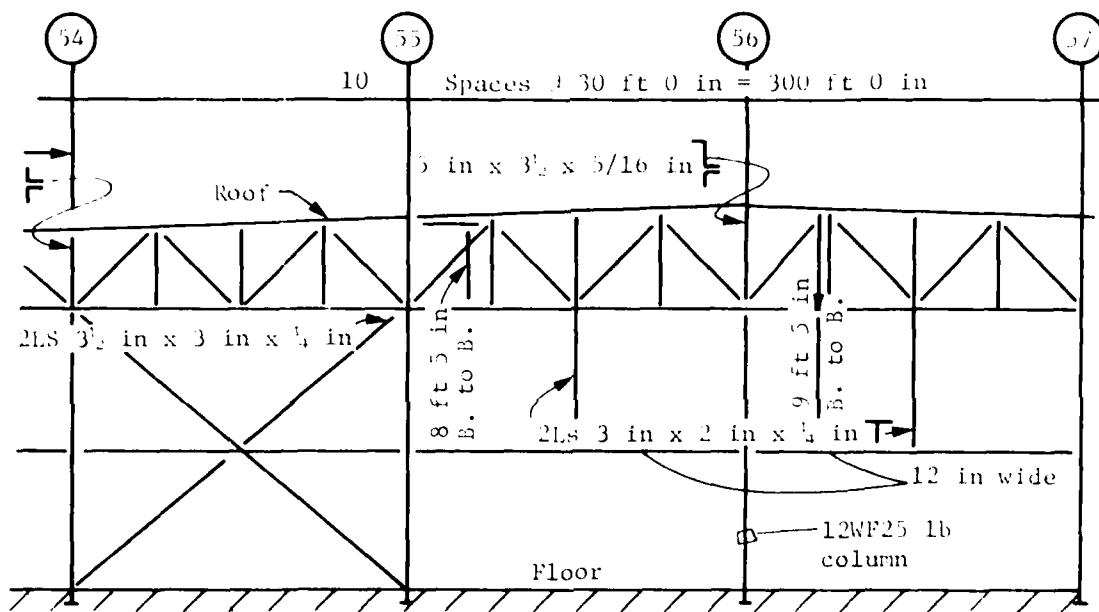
Roof supporting structure for Building 3001 adjacent to plating shop
